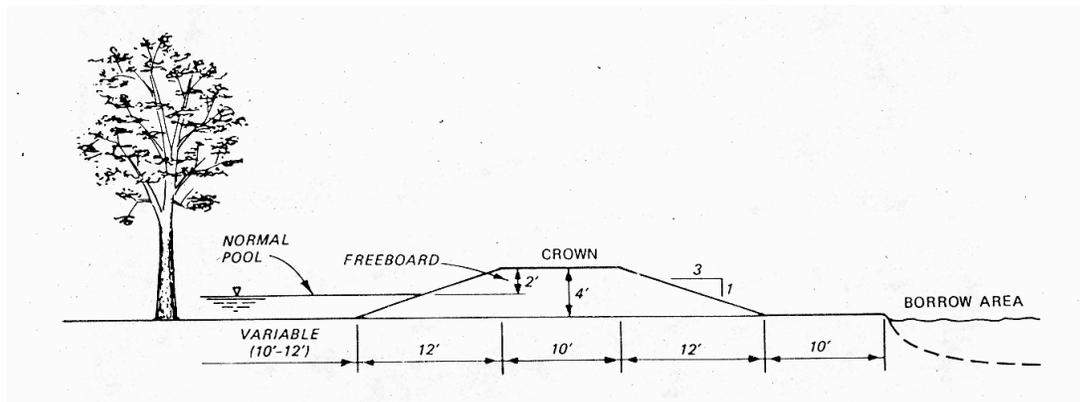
Cross-section of an impoundment levee with a 3:1 slope (source: Mitchell and Newling 1986).
